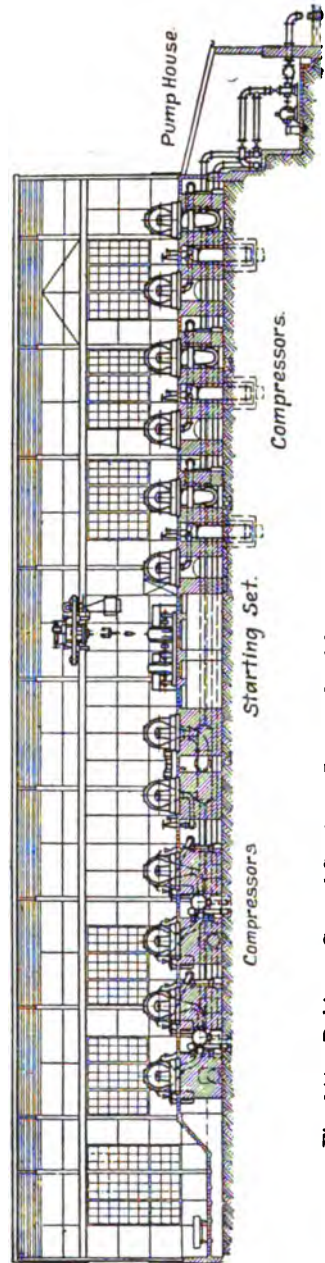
Robinson Central Station. Longitudinal Section through Engine Room and Pump House.
